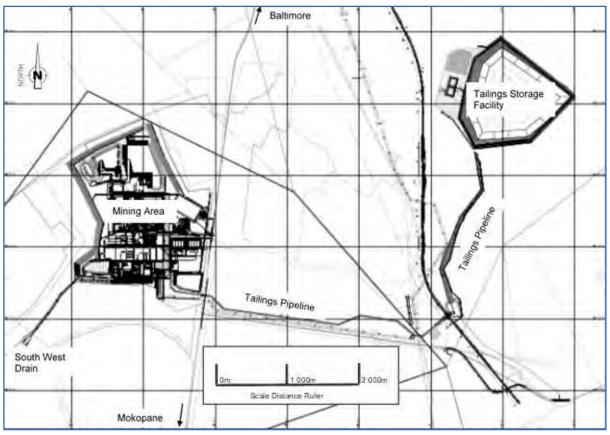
Mine and Rietfontein TSF Area Plot Plan
